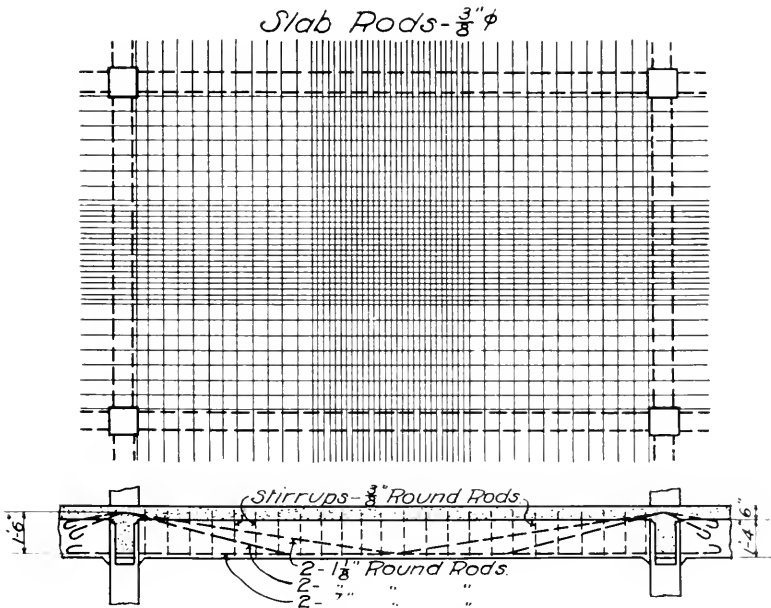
Details of Reinforcement in Panel of Minneapolis Paper Company Building.
